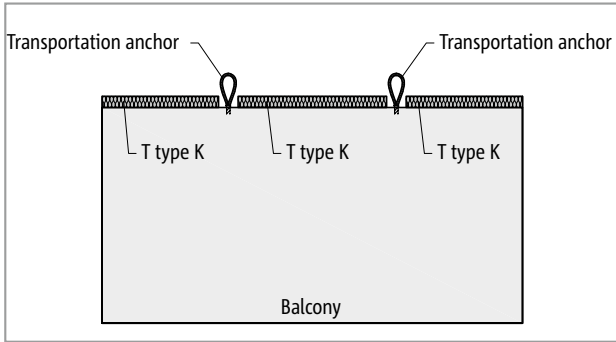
Schöck Isokorb® T type K: Precast balcony with transporter anchor; insulation spacer T type Z can be inserted on-site
